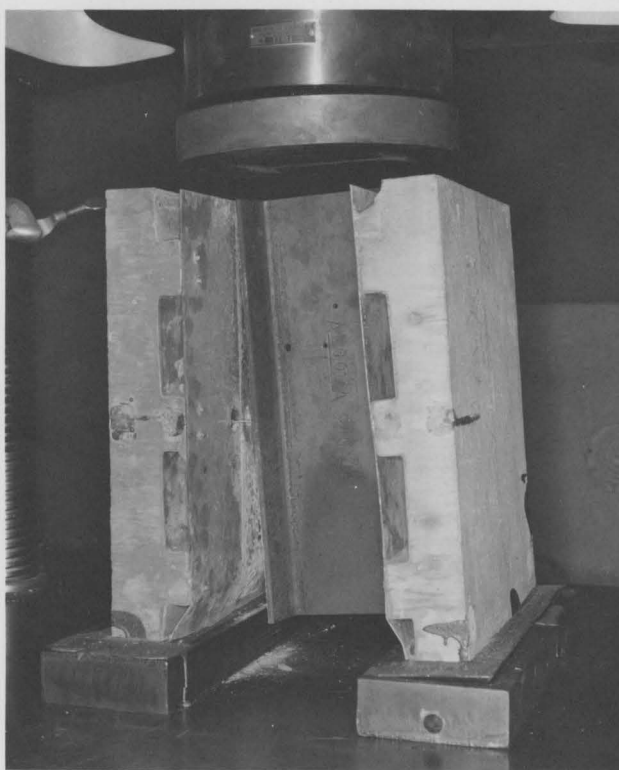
Push - Out Specimen, Failure due to Tensile Cracking of
